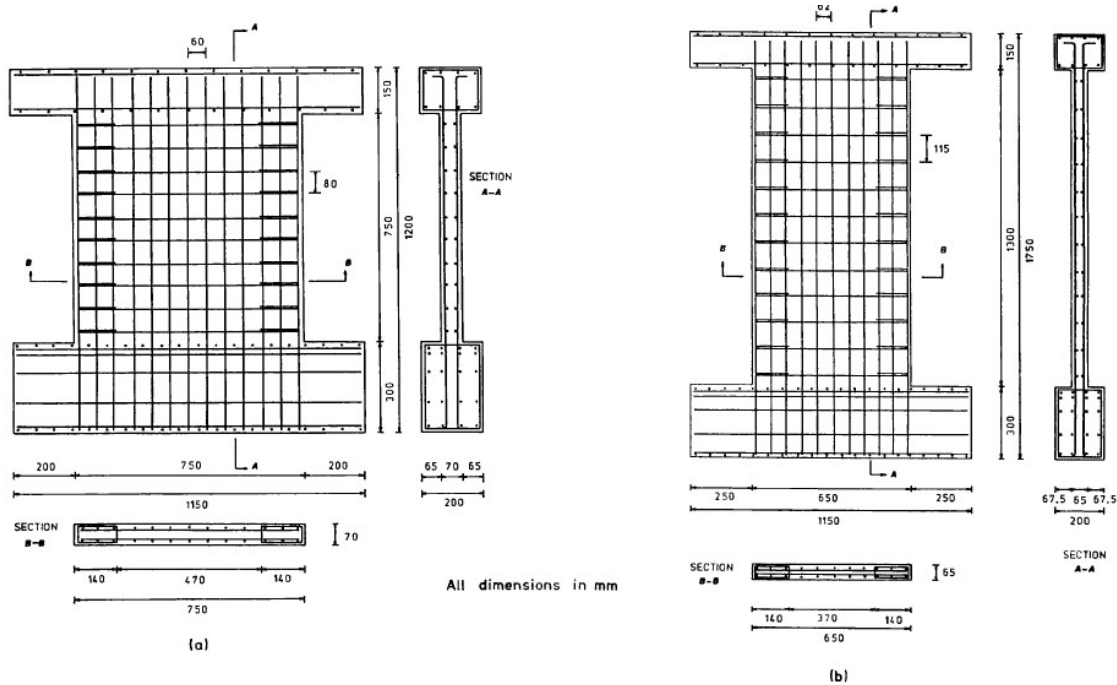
Typical details for walls tested by Lefas et al (1990)
